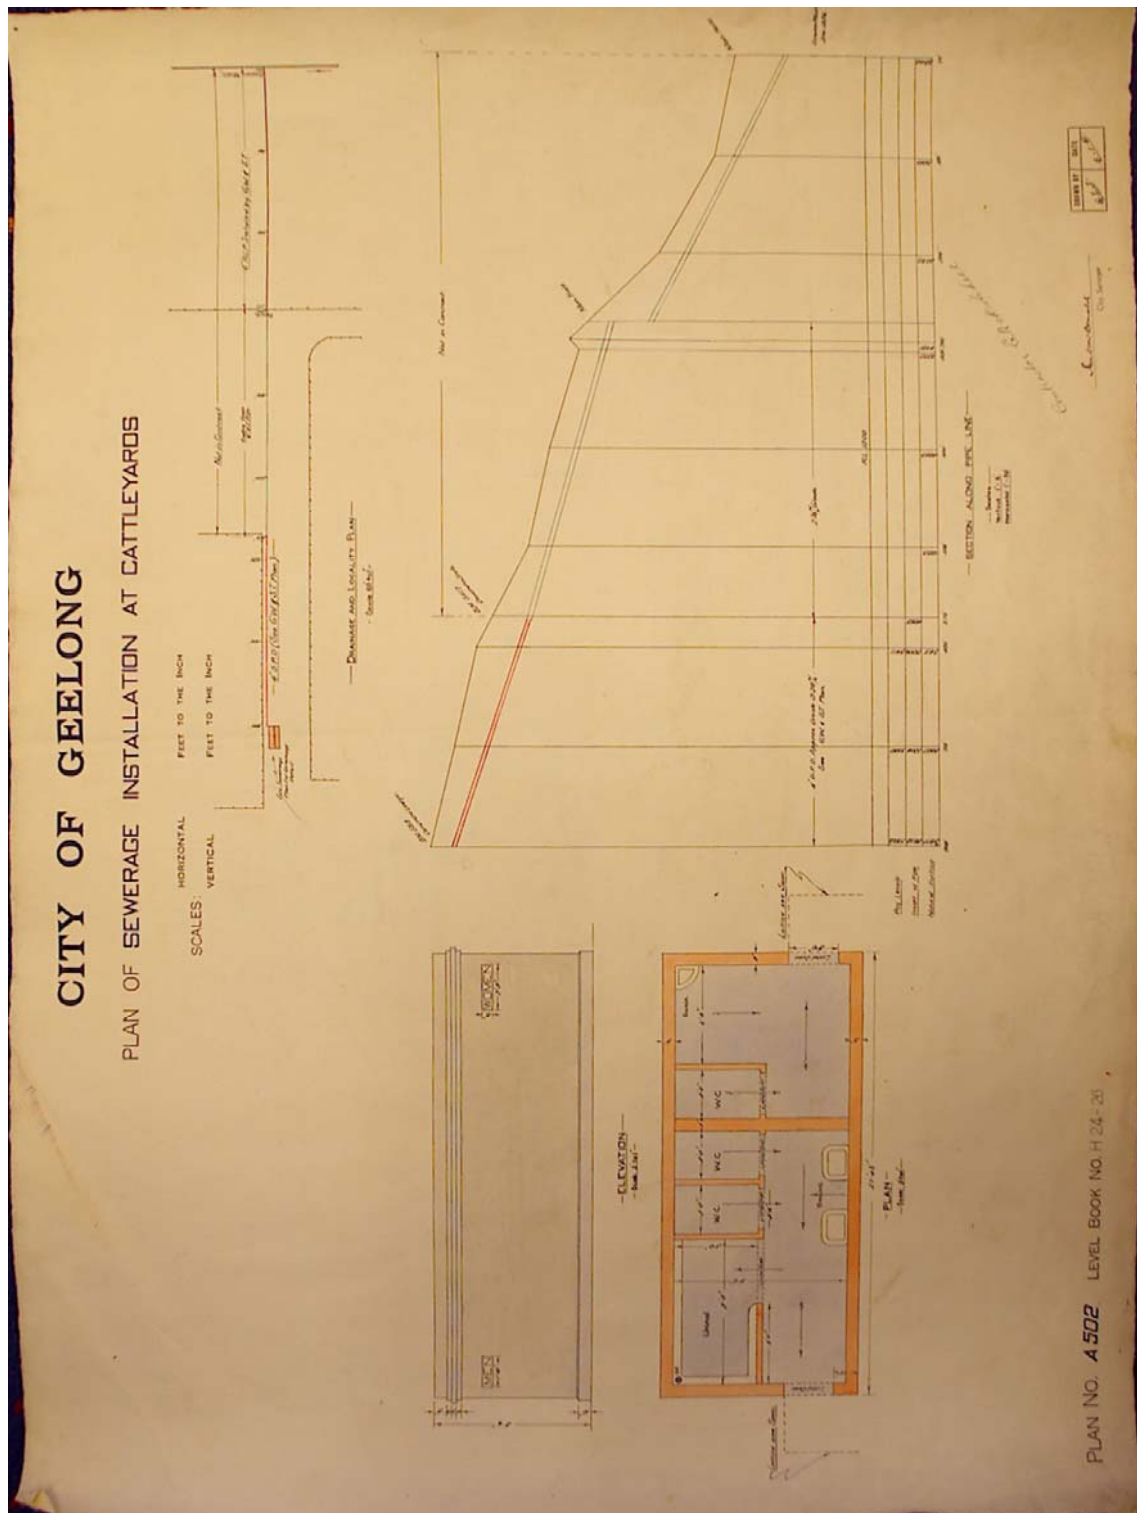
Plan of Sewerage Installation of Cattle Yards, showing new toilet block, 6 January 1941. Source: Geelong Council Plans collection, A502, Geelong Heritage Centre.
